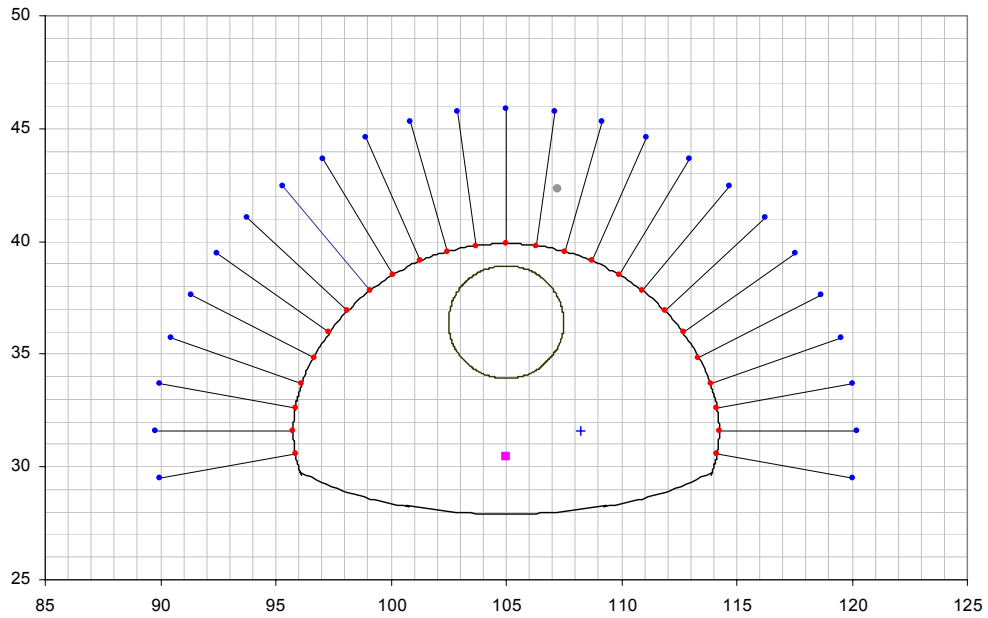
Geometry and rock bolt locations for the Shimizu tunnel No.3.
